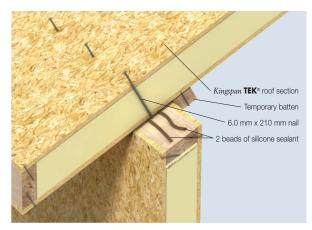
Wall / Roof Intersection Showing Bevelled Headplate Detail
